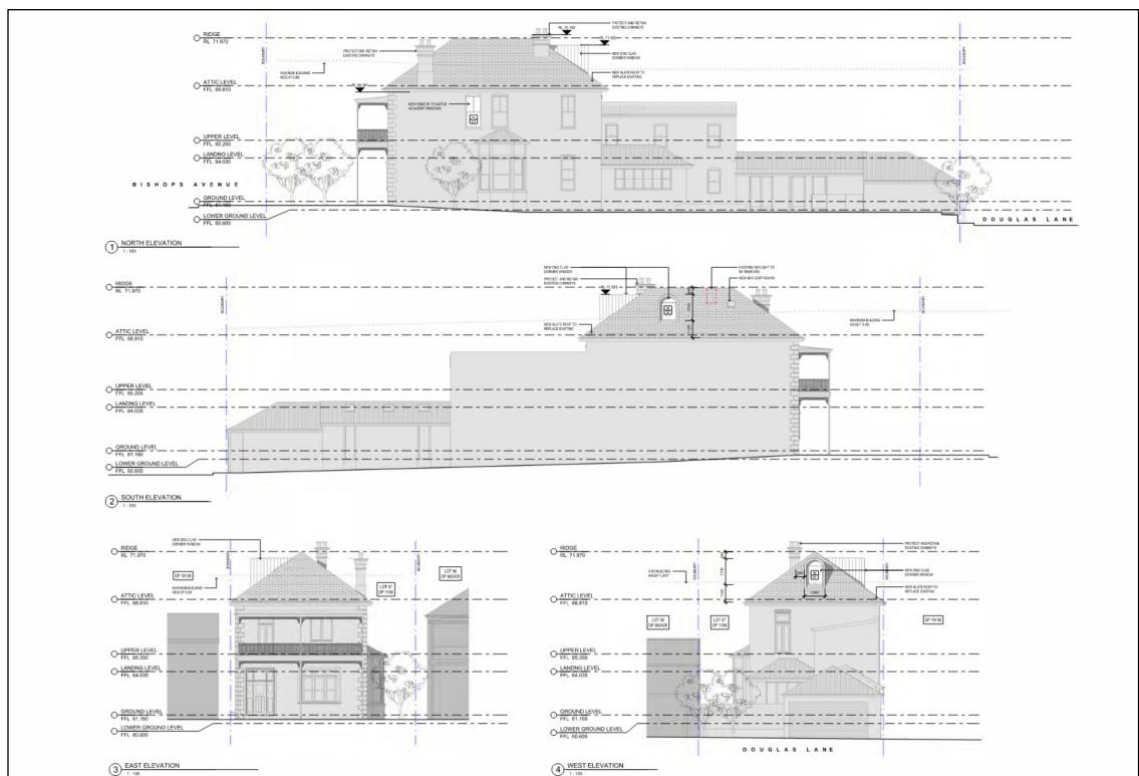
Extracted from Elevations (Source: Source Architects Pty Ltd)
